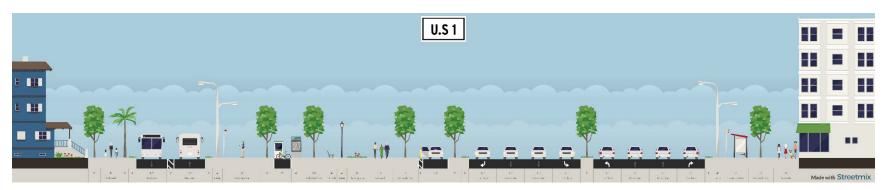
Proposed Street Section of Transitway & U.S. 1 / South Dixie Highway
